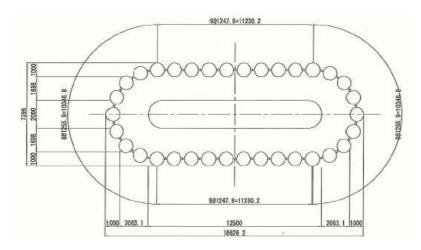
Configuration of sheet piles installed (34 Numbers)
